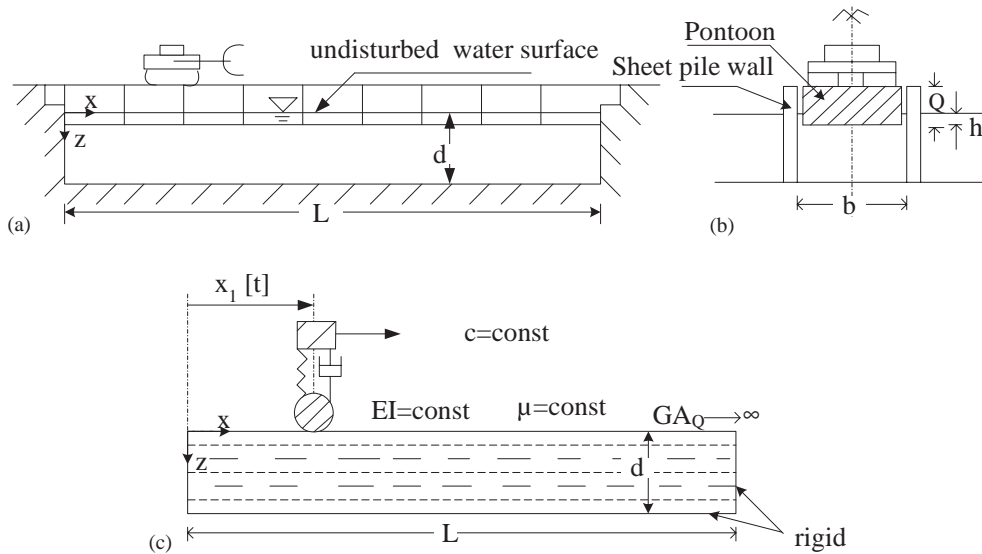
System and load of the concerned floating bridge (a) longitudinal section, (b) cross-section, (c) model.
